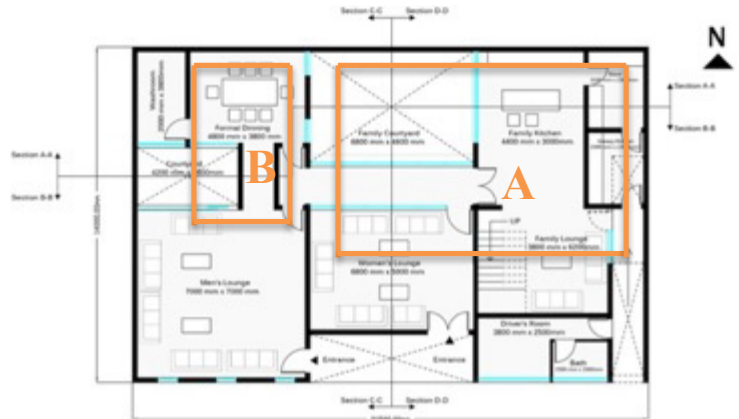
Ground floor plan of the new dwelling design (By researcher).
